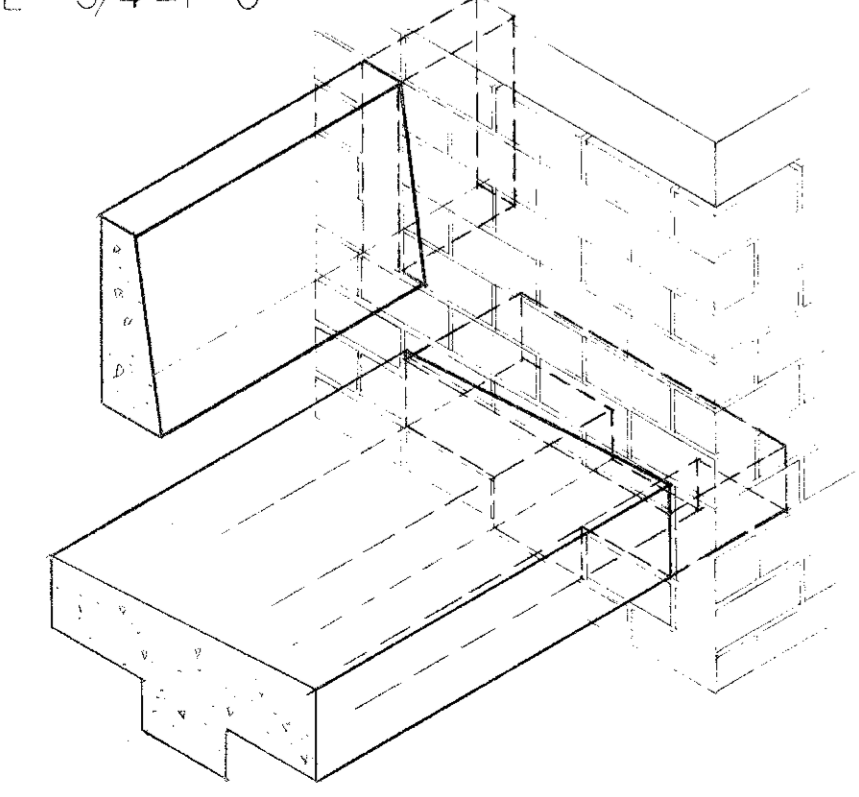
SIDEWALK & ROCK SCALE: 1 1/2"=1'-0"
